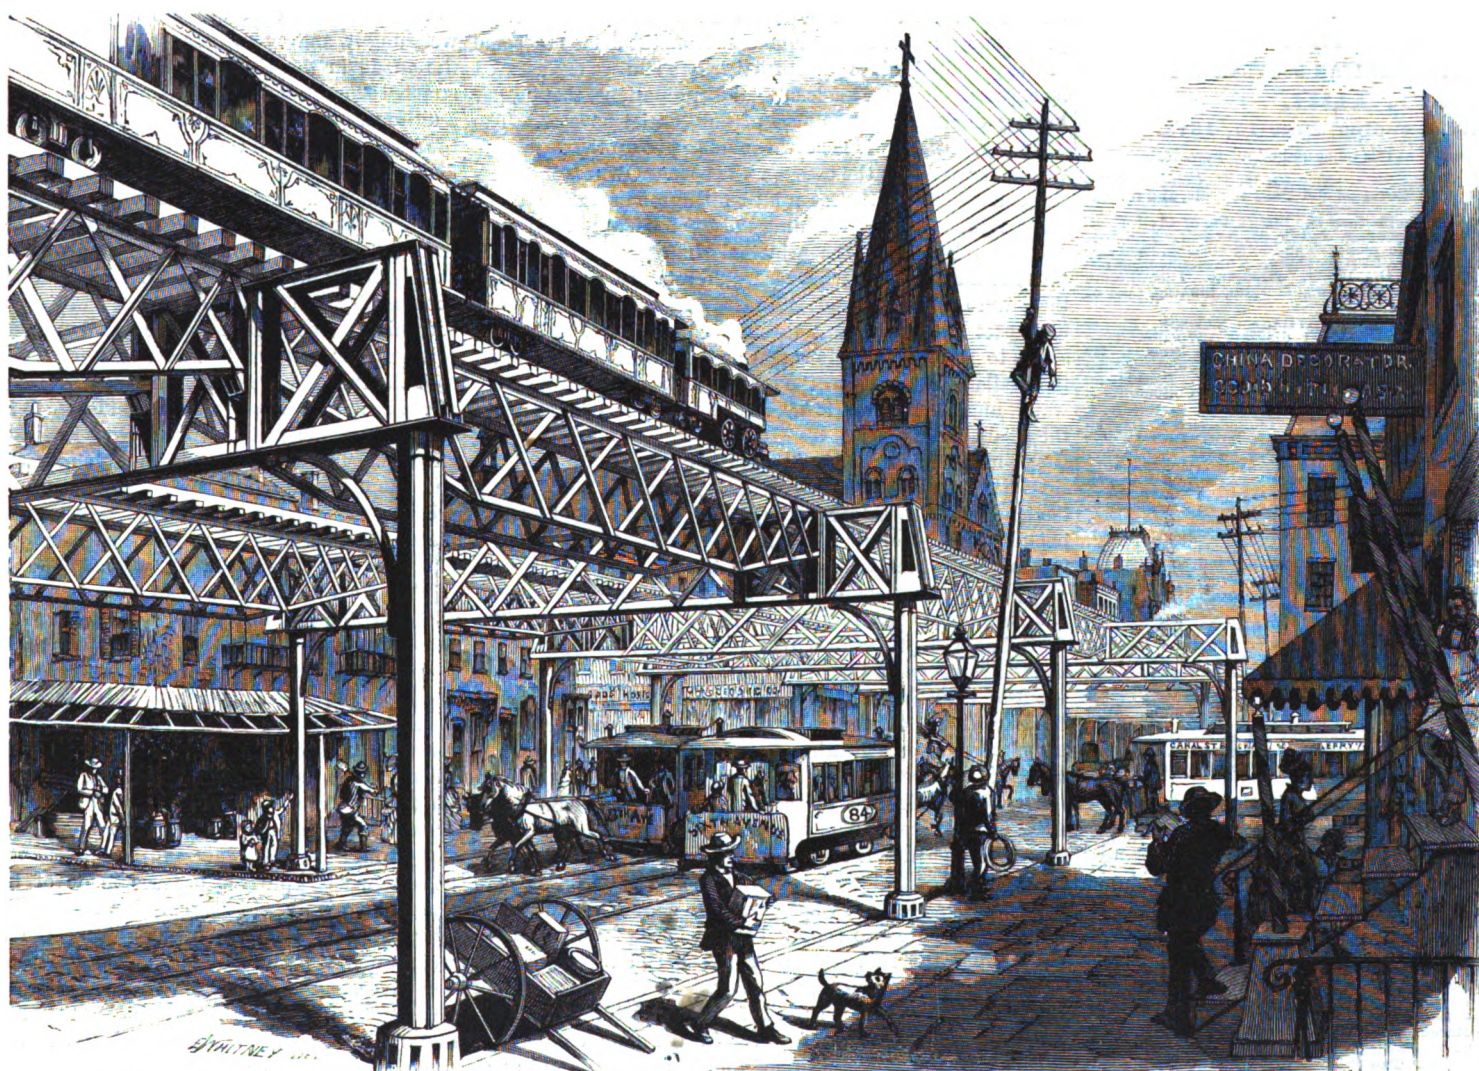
ELEVATED RAILROAD, WEST BROADWAY AND CANAL STREET.
